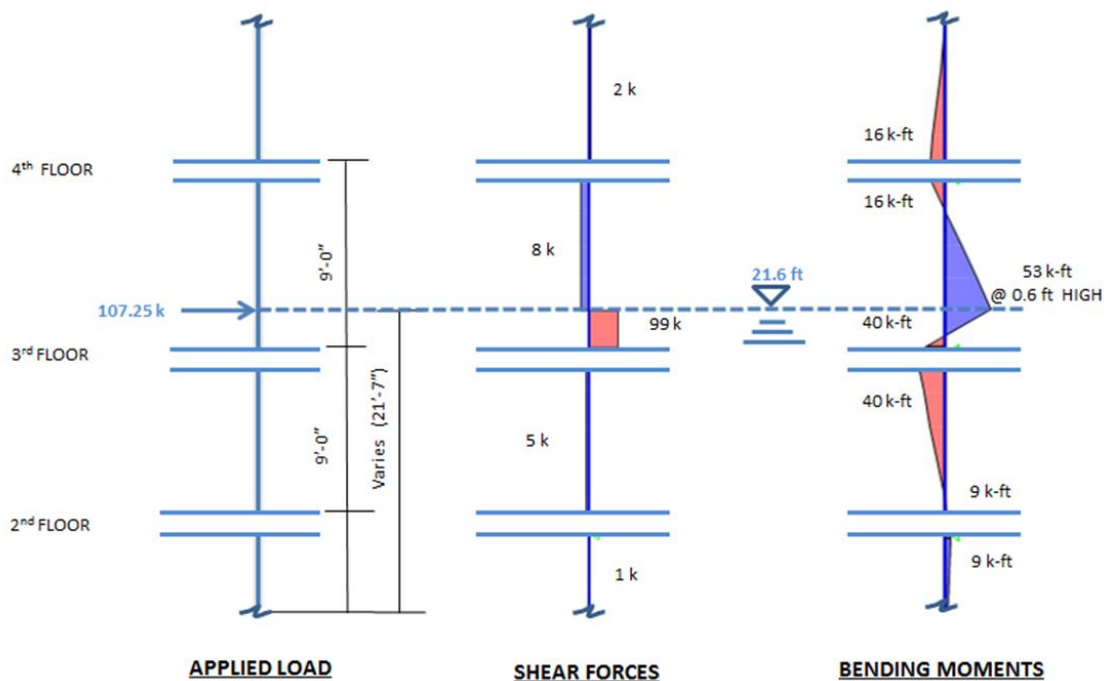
Impact load applied at 0.6 ft away instead of mid-height as water level is lower than mid-height away from the end of column on the 3rd floor
